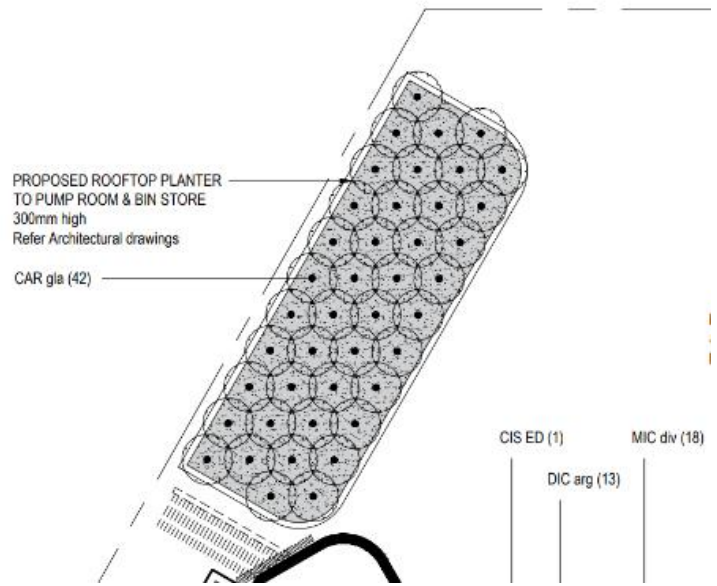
Proposed Landscaping on Amended Fire Pump Room Roof
